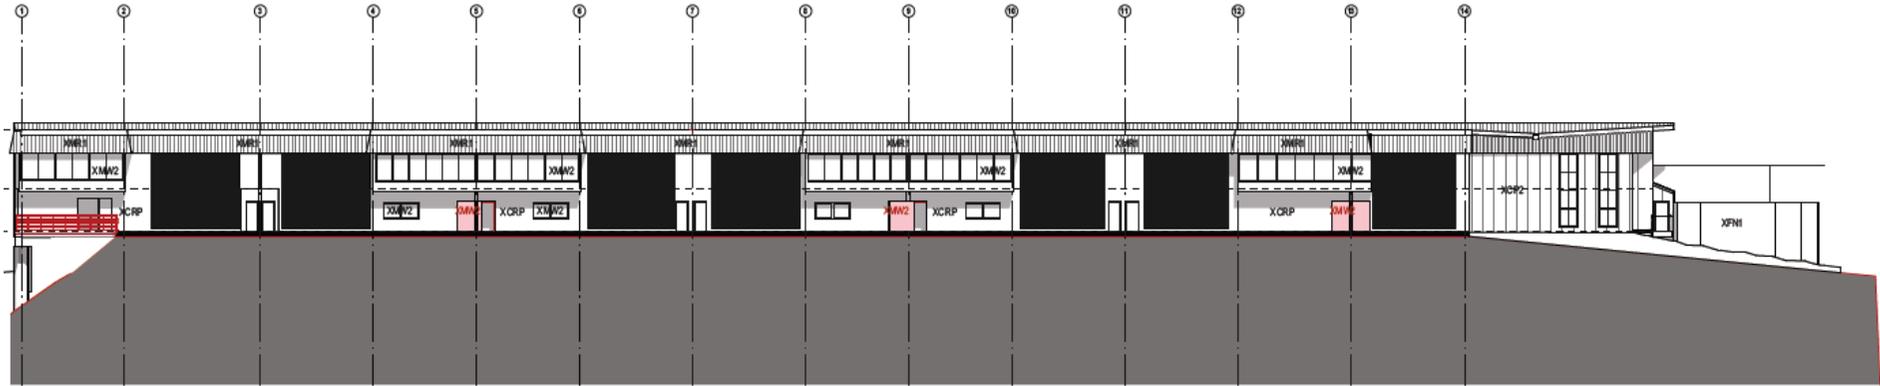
Extent of proposed excavations at 224 Headland Road, western elevation (Source: Demolition Elevations – 224 Headland Road, A-043, Rev A, 29/10/2019, Tonkin Zulaikha Greer Architects)
